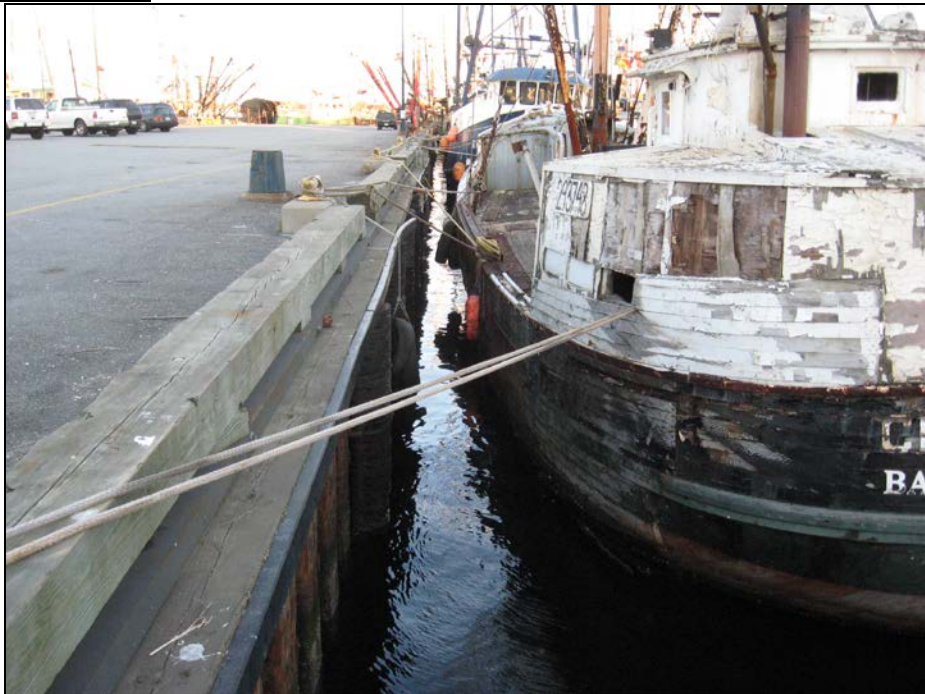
View of proposed project area, where a section of existing pavement will be sawcut, and pier fill excavated to access internal hardware for replacement and repair.
